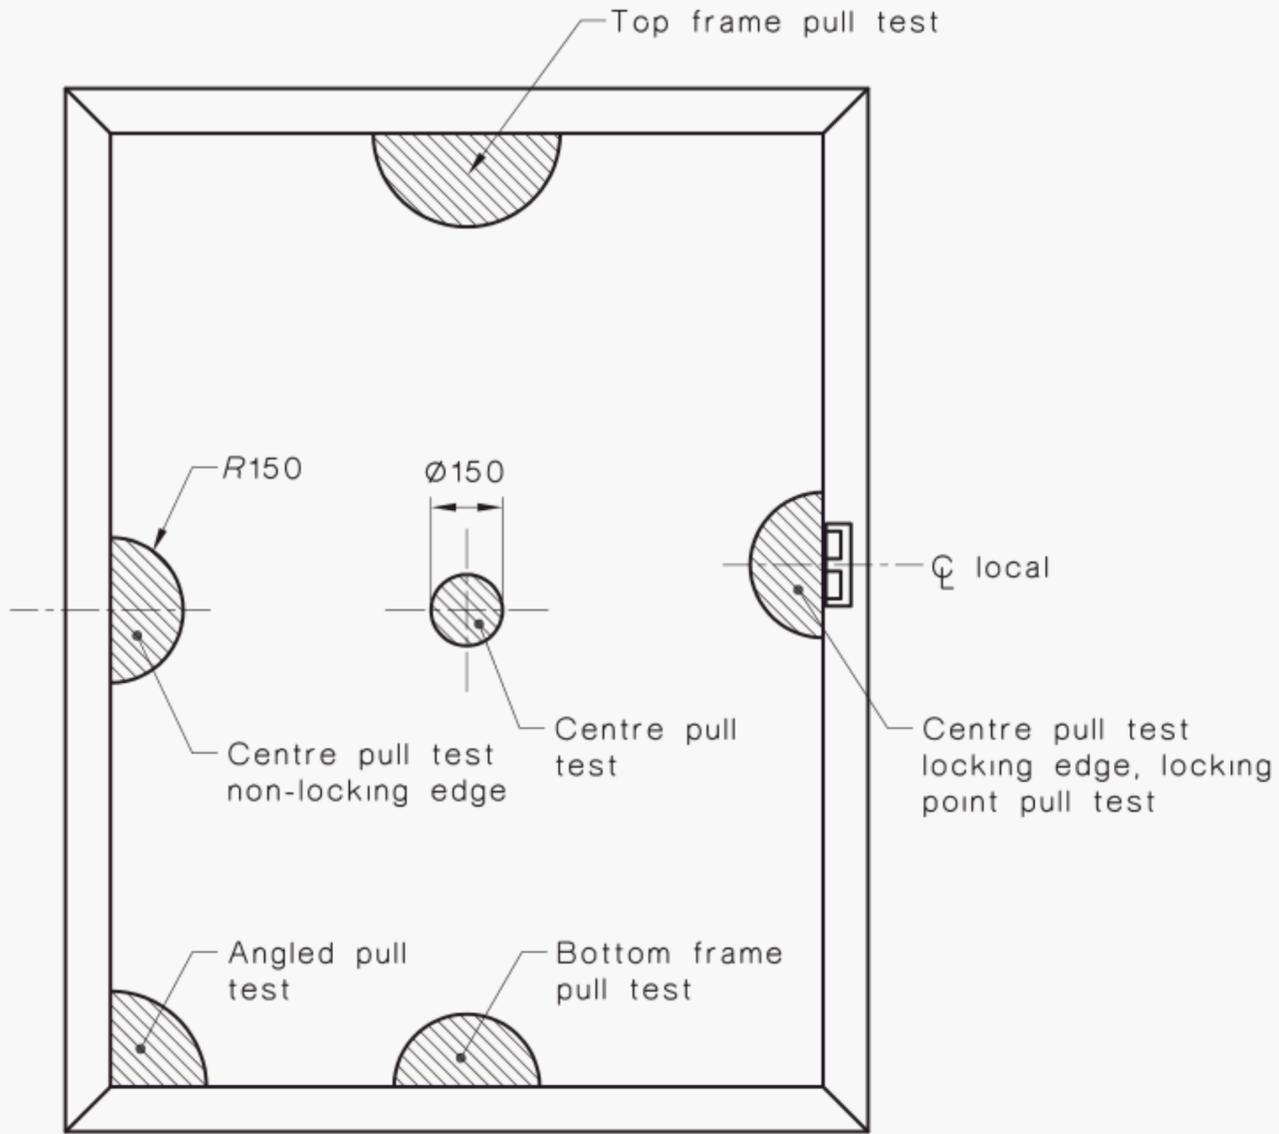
(A) HALF PANEL HINGED DOOR PULL TEST POSITIONS
